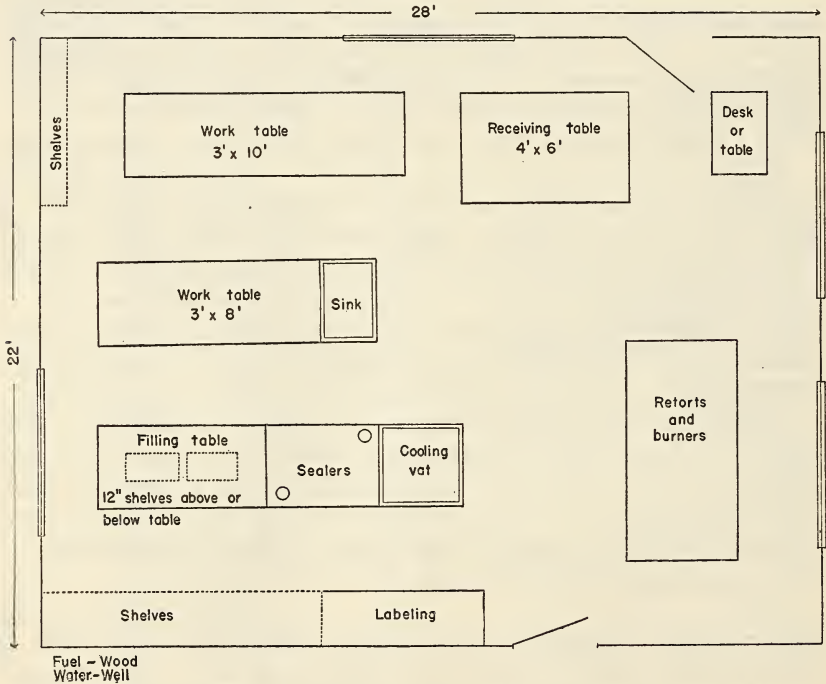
Suggested floor plan for canning center, 22 feet by 28 feet (Extension Service, College Station, Tex.).
